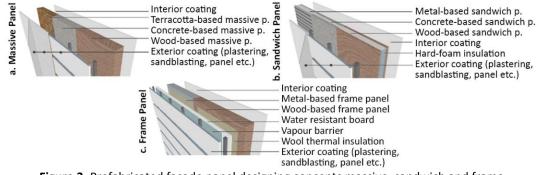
Prefabricated facade panel designing concepts massive, sandwich and frame
